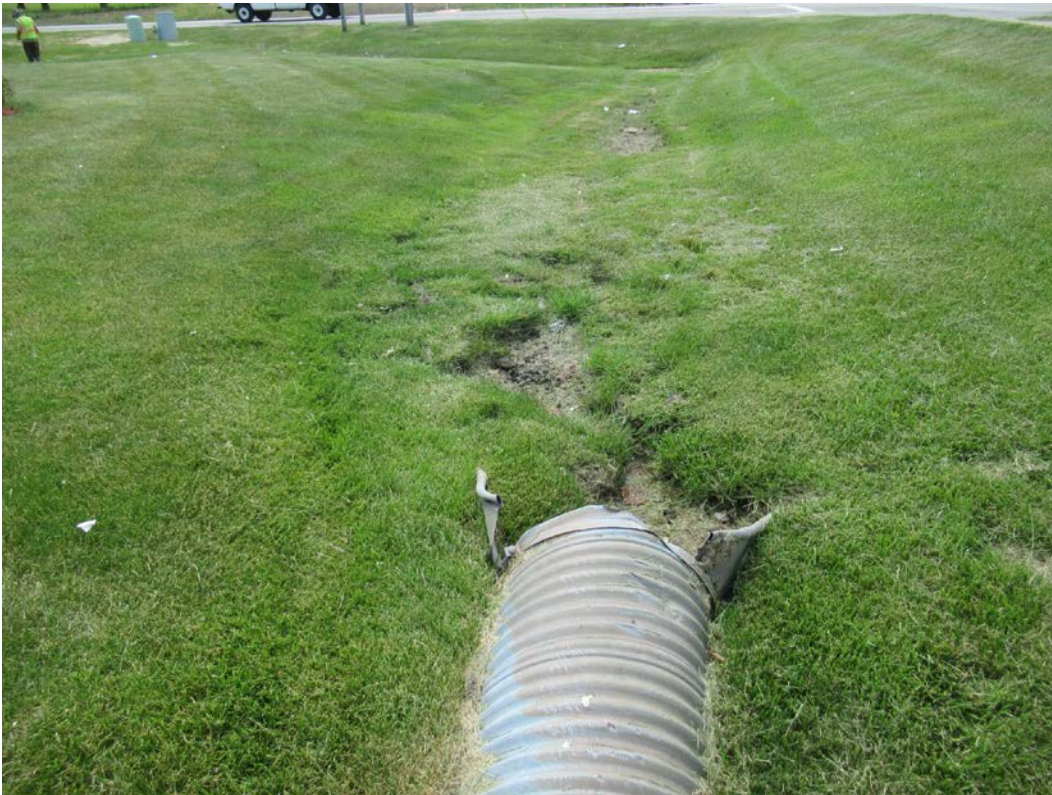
East view with storm sewer inlet at the SE corner of STH 50 and 256th Avenue.
